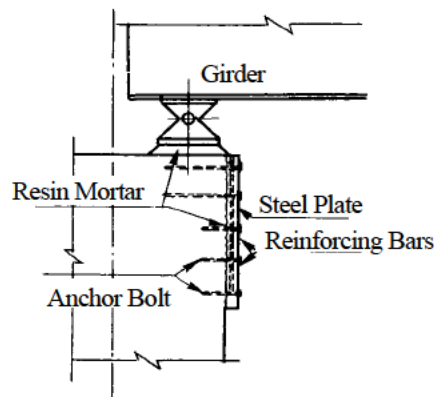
Steel Plate Attachment (One side Connection)
